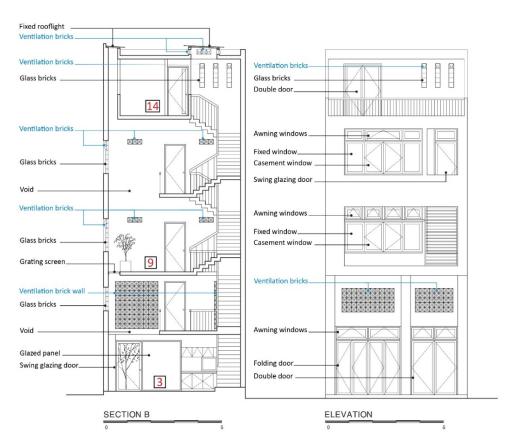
Building elements for passive designs in the house A2 (section B and elevation)
